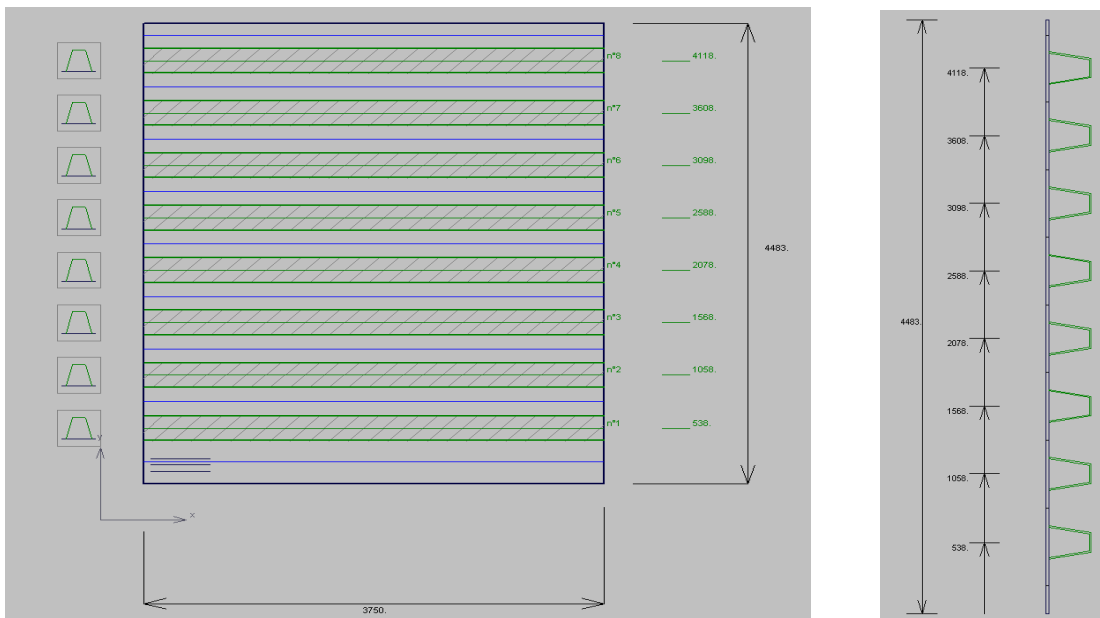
Illustration of a plate panel 2 of the roadway girder including dimensions
